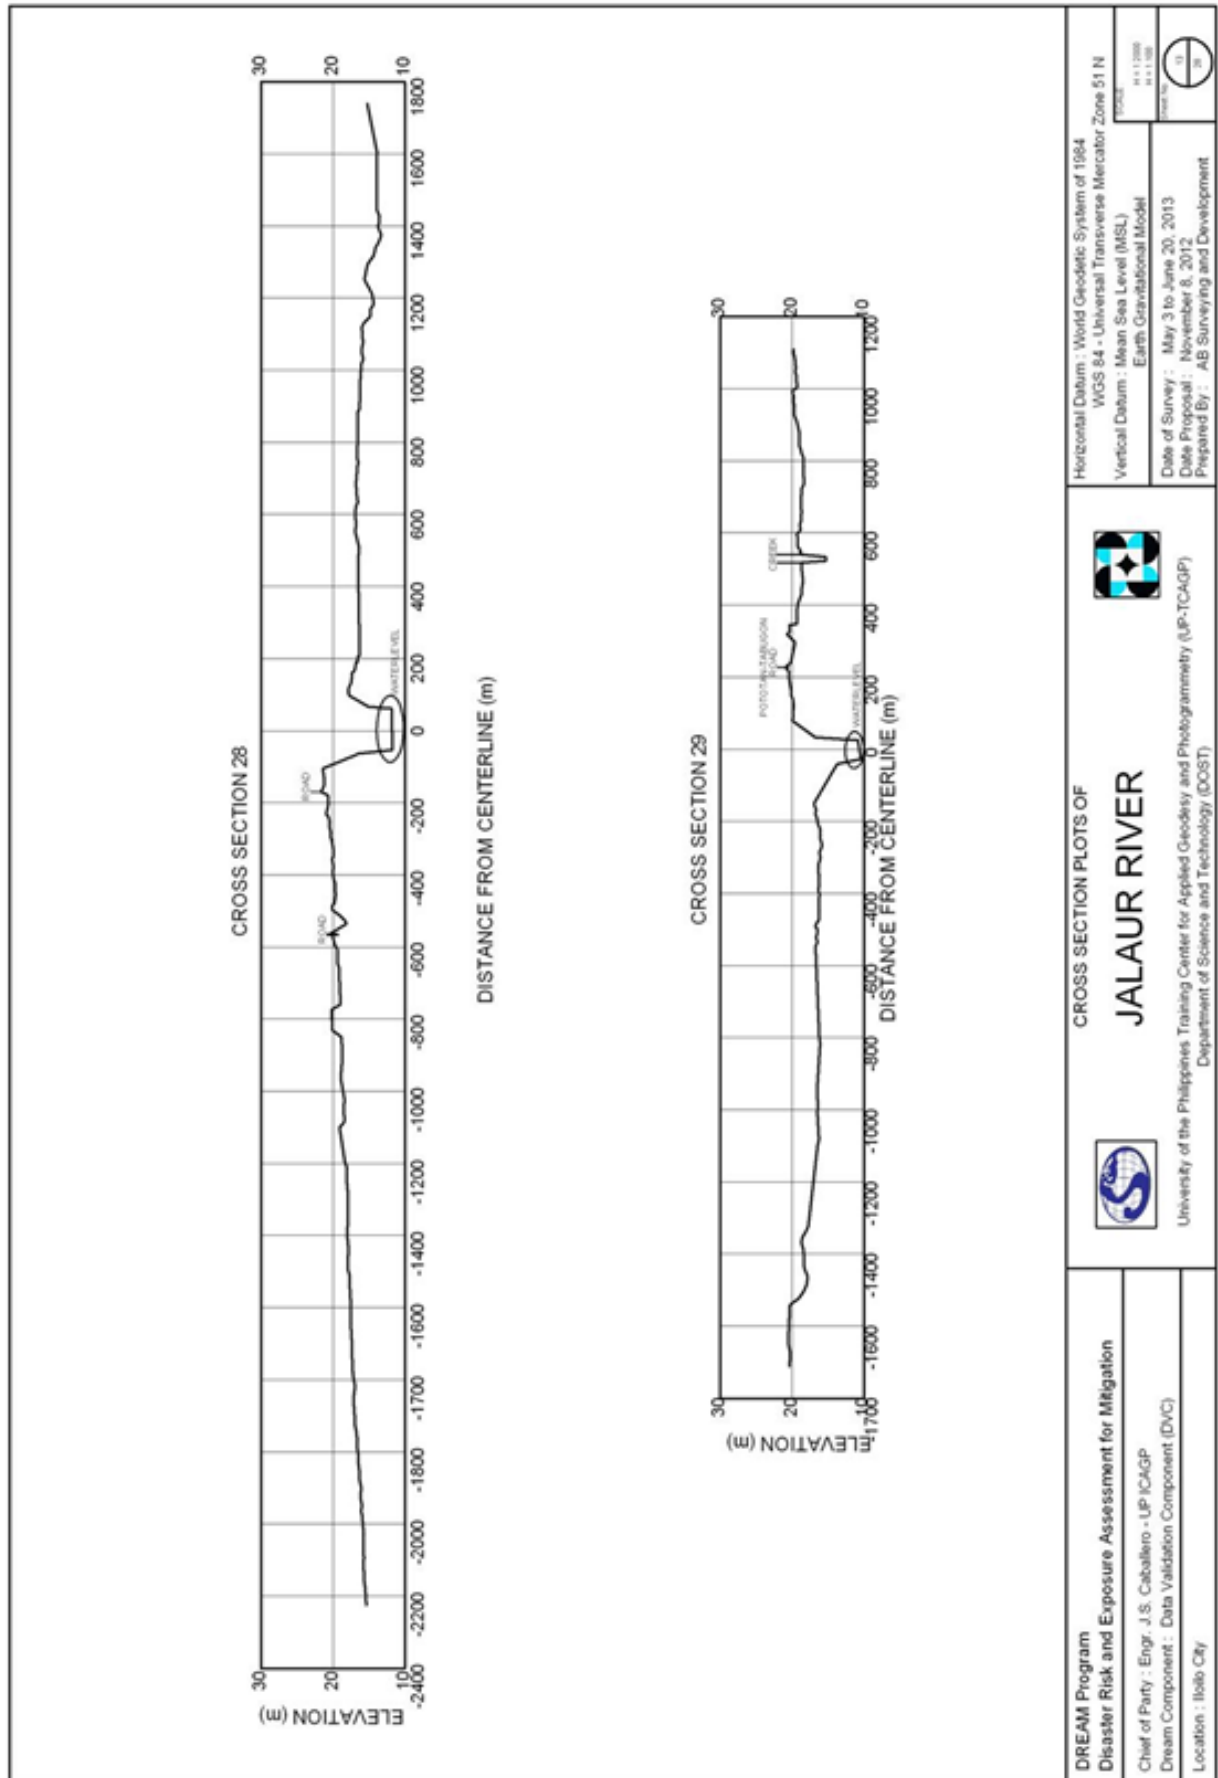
Sheet No.13 of the Cross-section plan of Jalaur River
